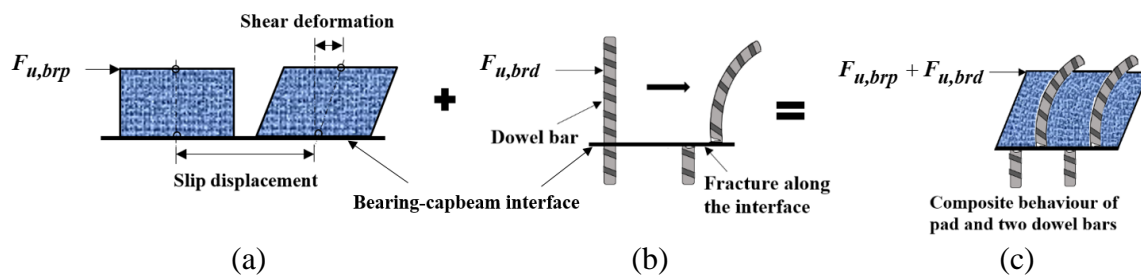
Seismic behaviour of (a) pad, (b) dowel bar and (c) bearing assembly.
